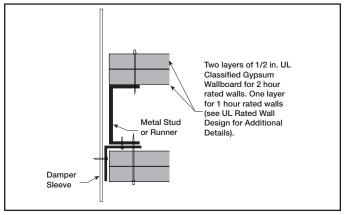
Single Side Angle With Steel Stud Wall - Angle Under Wallboard
